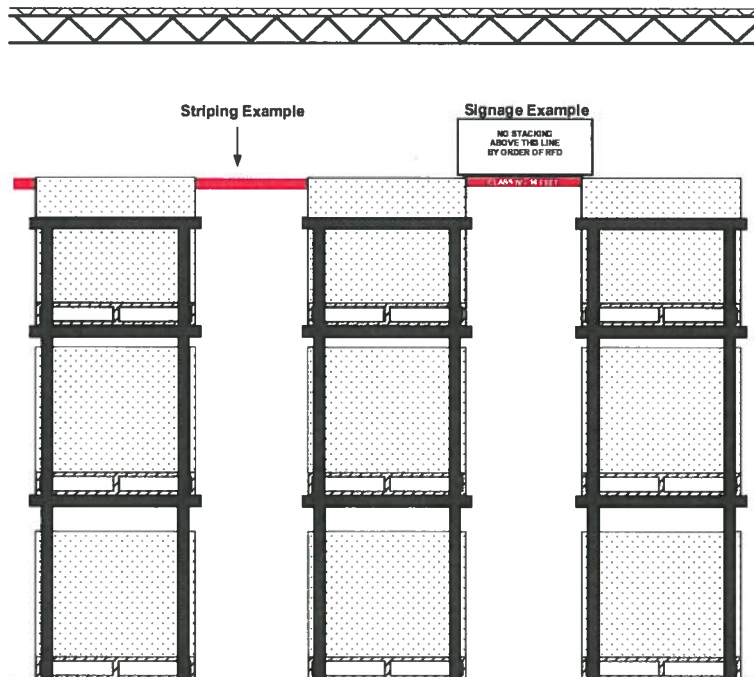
END OF AISLE VIEW OF SIGNAGE AND STRIPING PLACEMENT EXAMPLE
